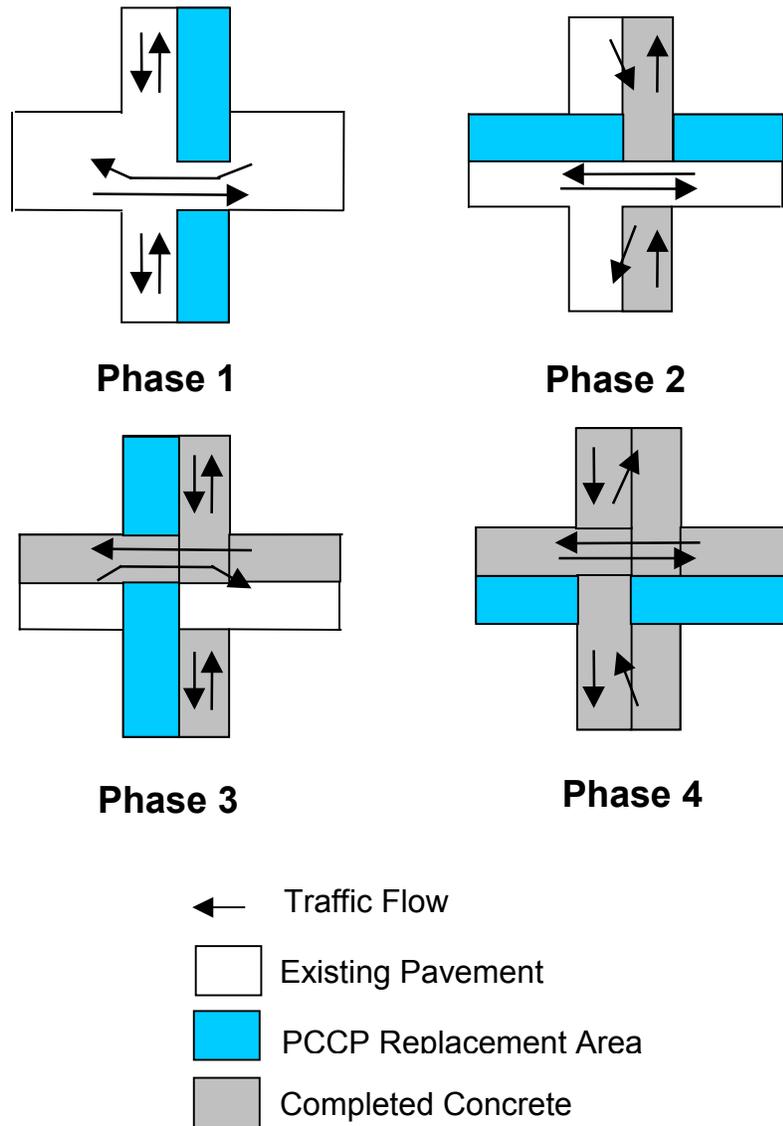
Traffic staging scenario – construction by lane (figure courtesy of American Concrete Paving Association).
